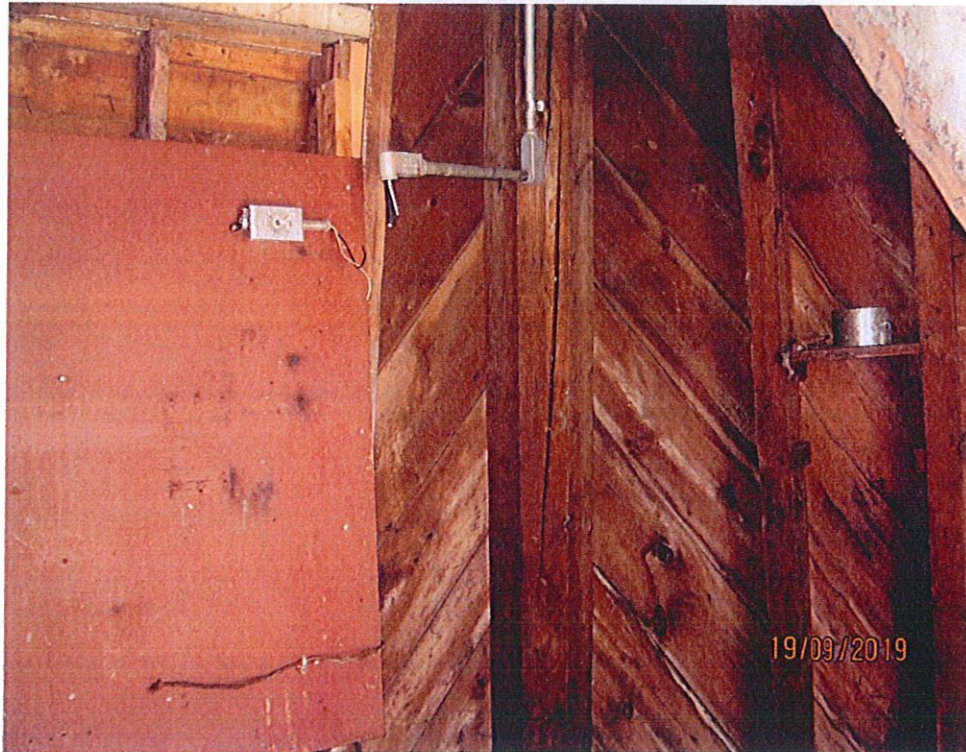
View of the 1<sup>st</sup> level interior walls and electrical connection.
